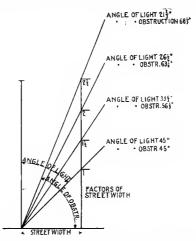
Angles of light and of light obstruction on ground floor on street front.
